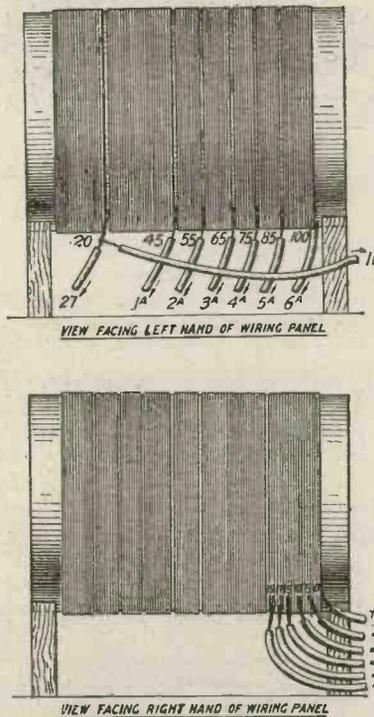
A close-up view of each side of the coil, showing the windings and the tapping points.
